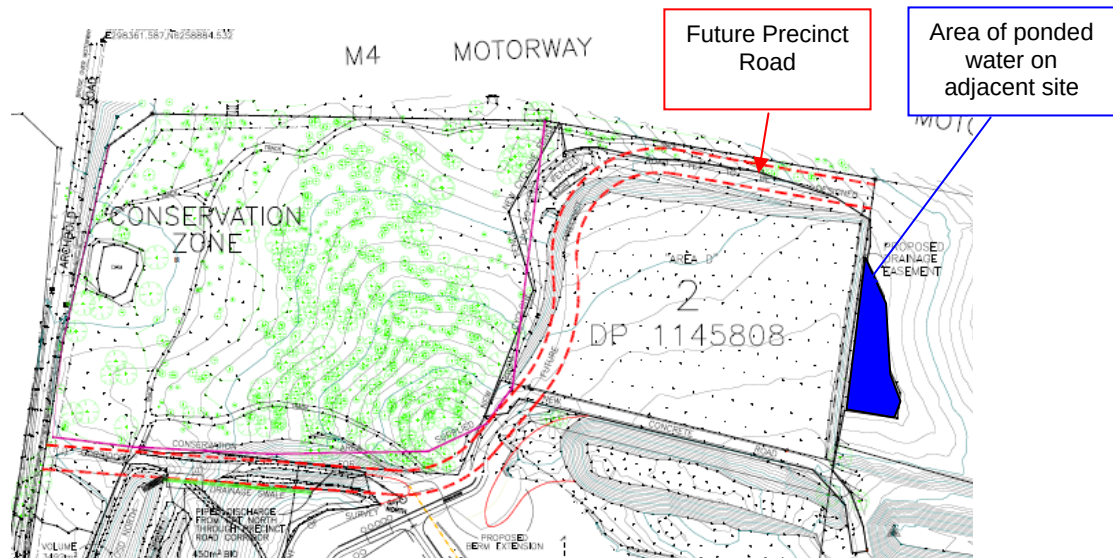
Excerpt from LandPartners plan showing ponding on Tesrol's land and the future precinct road
